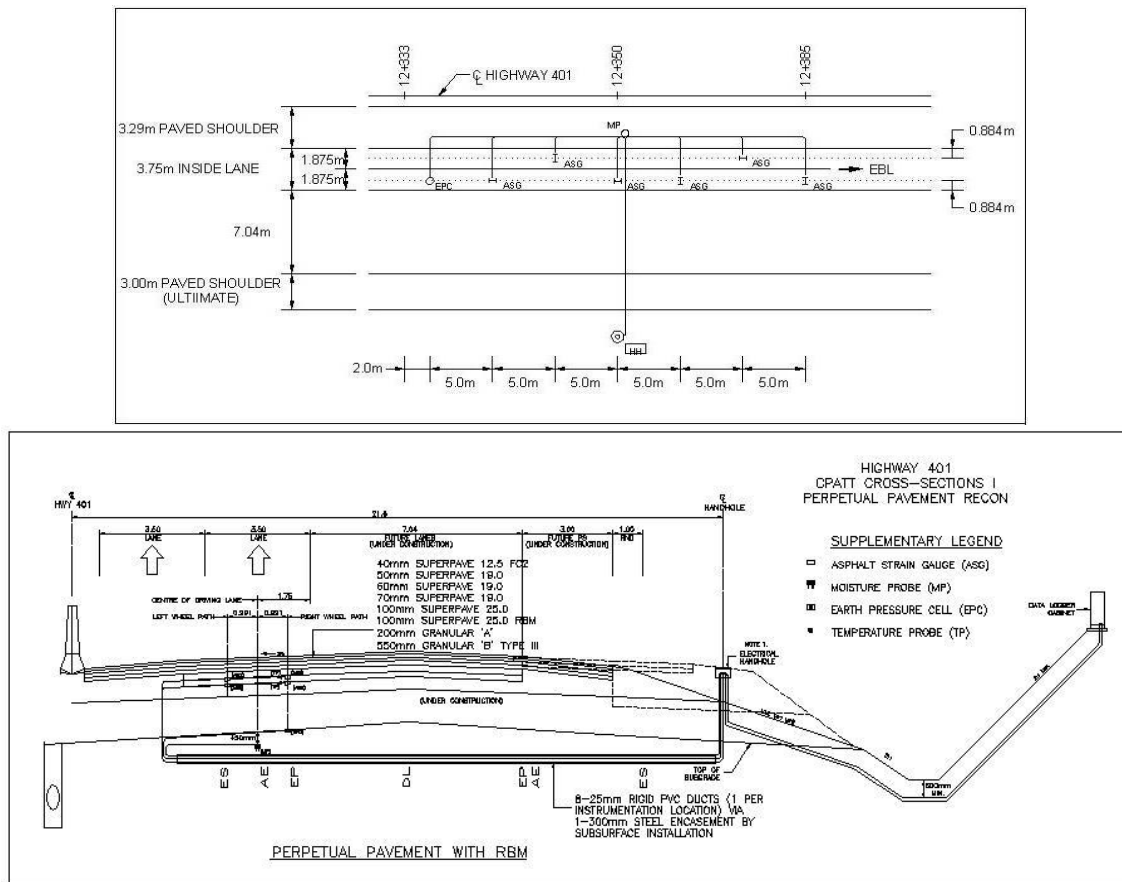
Plan and Cross-Section for the Perpetual Pavement Section with RBM
